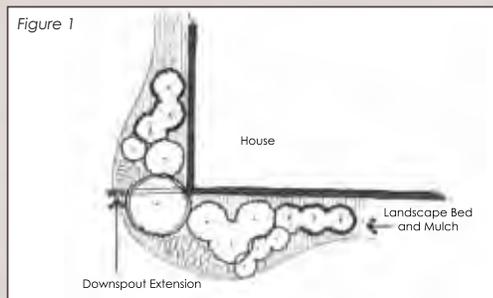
shows a downspout location near the corner of a house where a rain garden is being considered.
